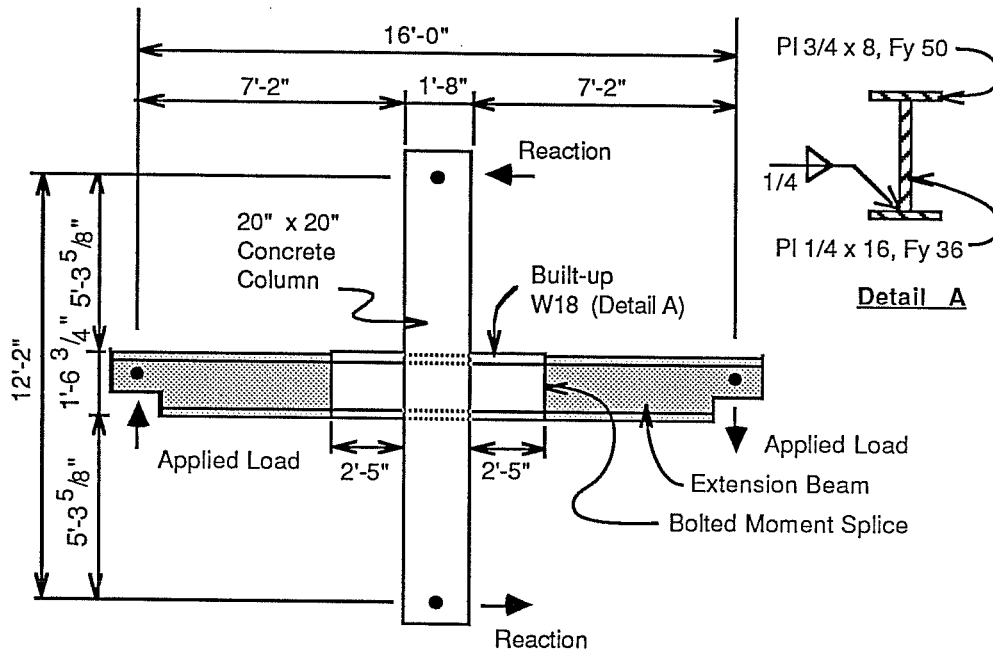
Typical Test Specimen (Specimens 3 to 9)
